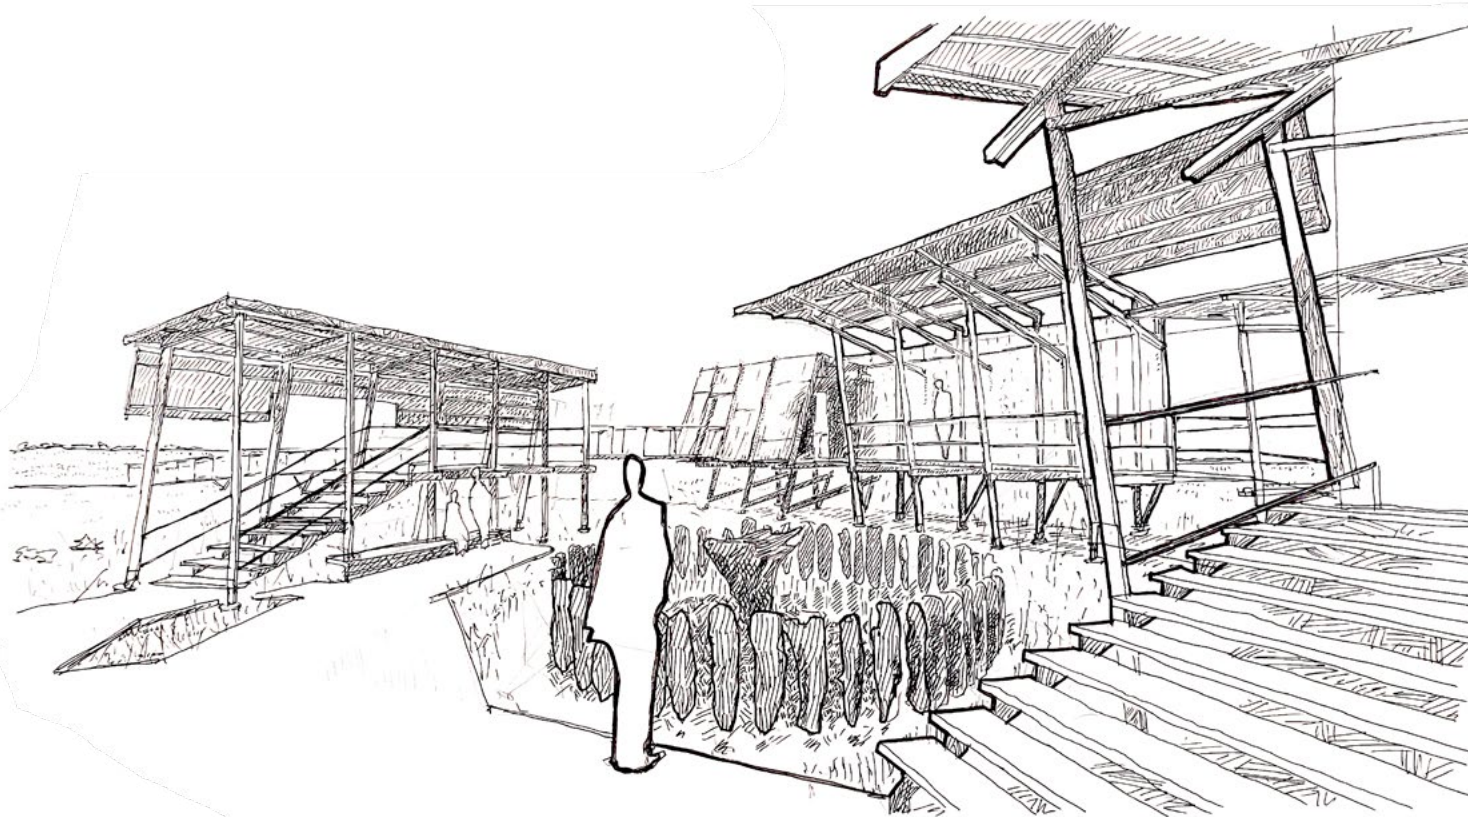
Walkway surrounding original timbers. Support structure of timbers not yet shown, see next page. (Author, 2023).
